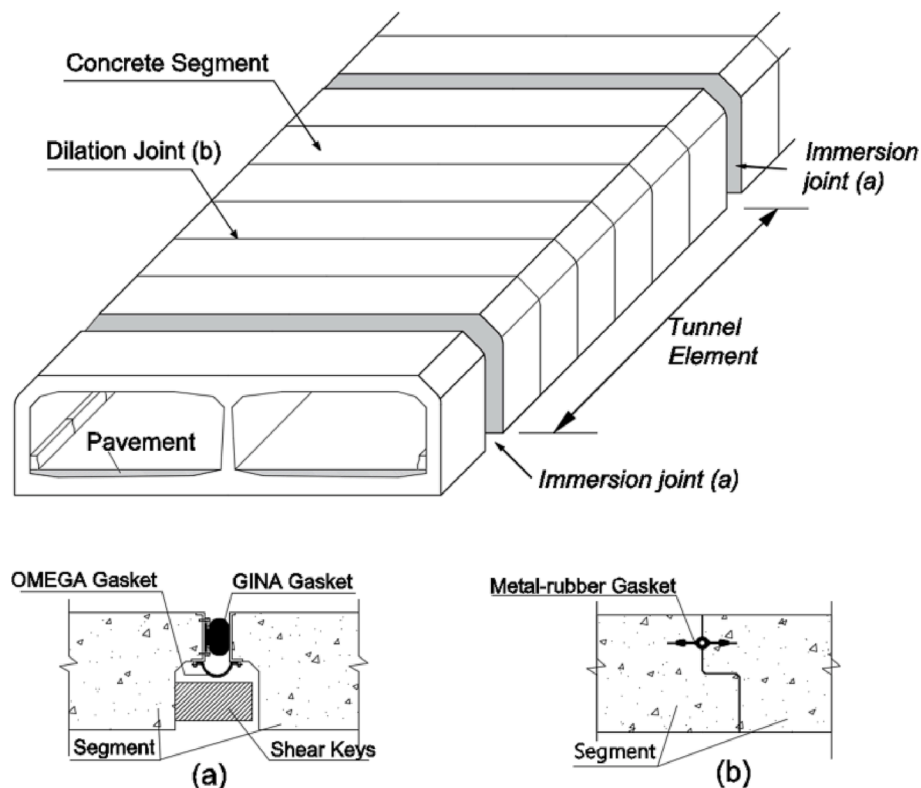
Segmented immersed tunnel and joint: (a)immersion joint and (b)dilation joint.
